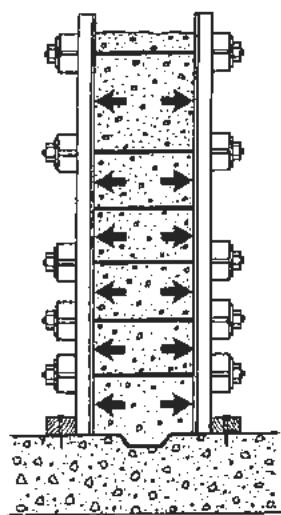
Pressure of Concrete on Vertical and Battered Formwork
